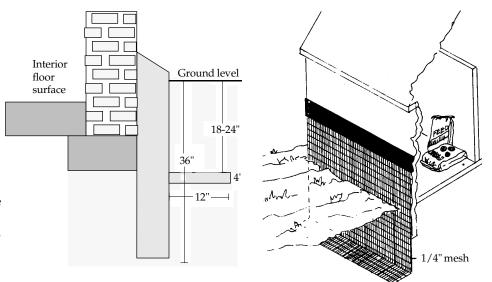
Left:* A curtain wall made of concrete will prevent rats from burrowing under foundations to gain entry to buildings. Curtain walls can be installed on existing buildings. A horizontal footing extension often deflects burrowing rodents away from structures. *Right:* Feed sheds, corn cribs, and other existing wooden structures can be rodent-proofed by installing hardware cloth topped by a band of sheet metal. The hardware cloth can also serve as a curtain wall to prevent rodent burrowing.
